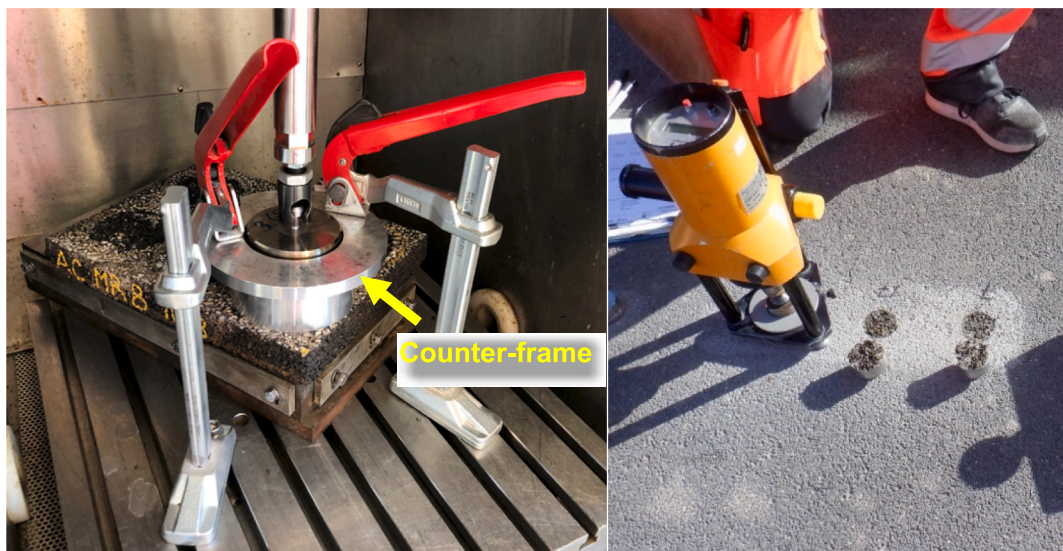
Left: test set-up in the universal testing machine with counter-frame; right: handheld pull-off device without counter-frame, here shown during on-site testing.
